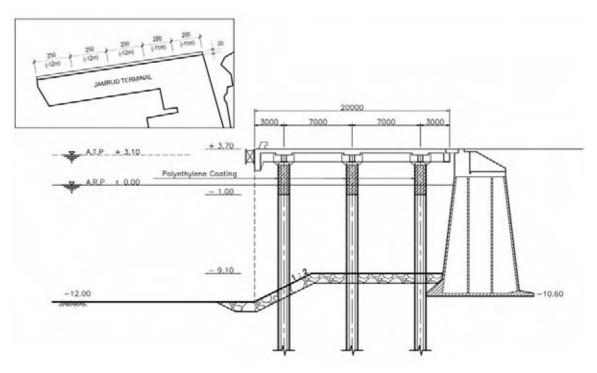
Typical Cross Section of the Wharf at North Jamrud Terminal
